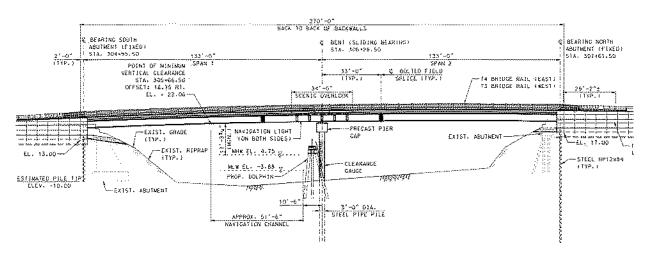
Elevation of Proposed Bridge. (See Attachment 2 for more information)
